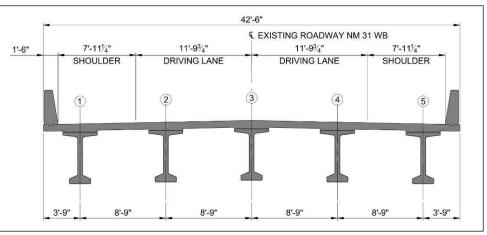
Existing Bridge No. 9285 Transverse Section View
